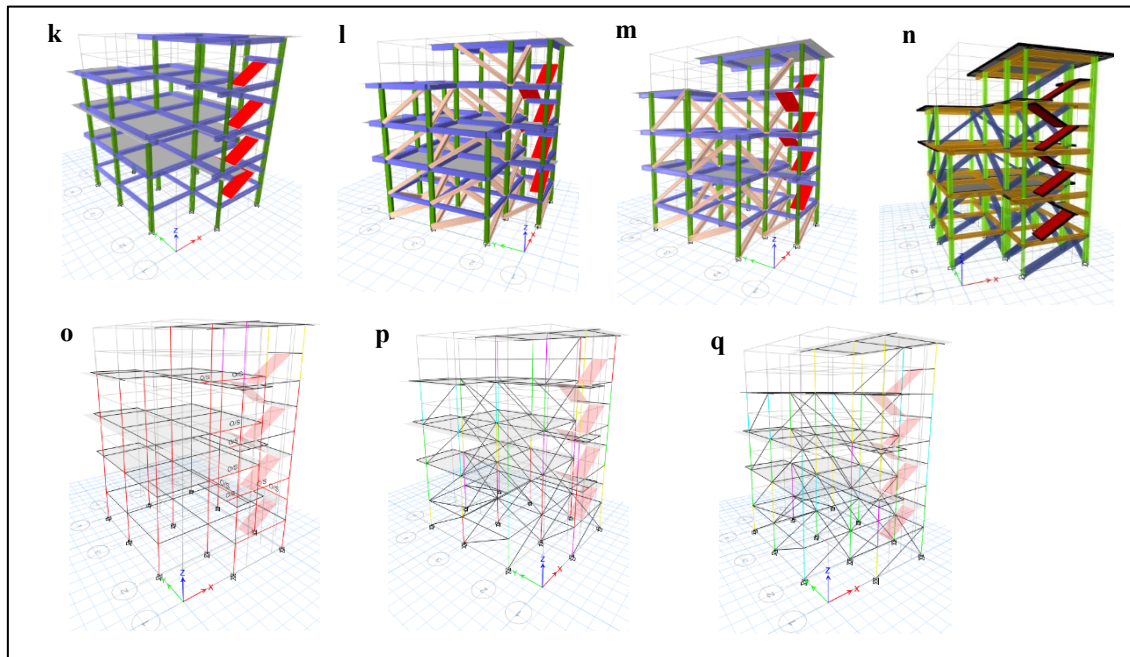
Structural simulation Etabs model:In bare frame (k), brick infill wall frame (l), EPS wall panel frame after energy retrofit (m),column retrofitted model (n), Failure of column and
